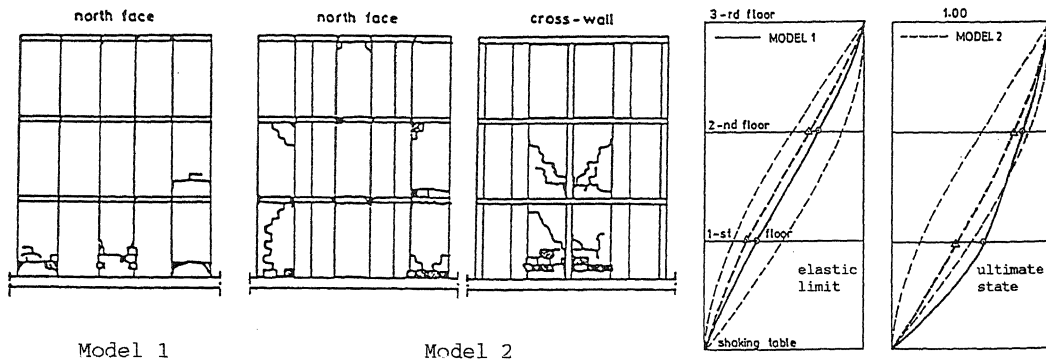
Typical crack patterns before collapse Fig. 6 First natural mode shapes
